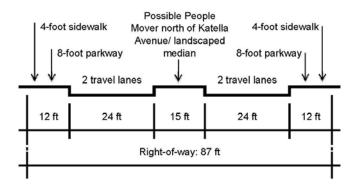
Ball Road (East of Cast Place) Cross Section
